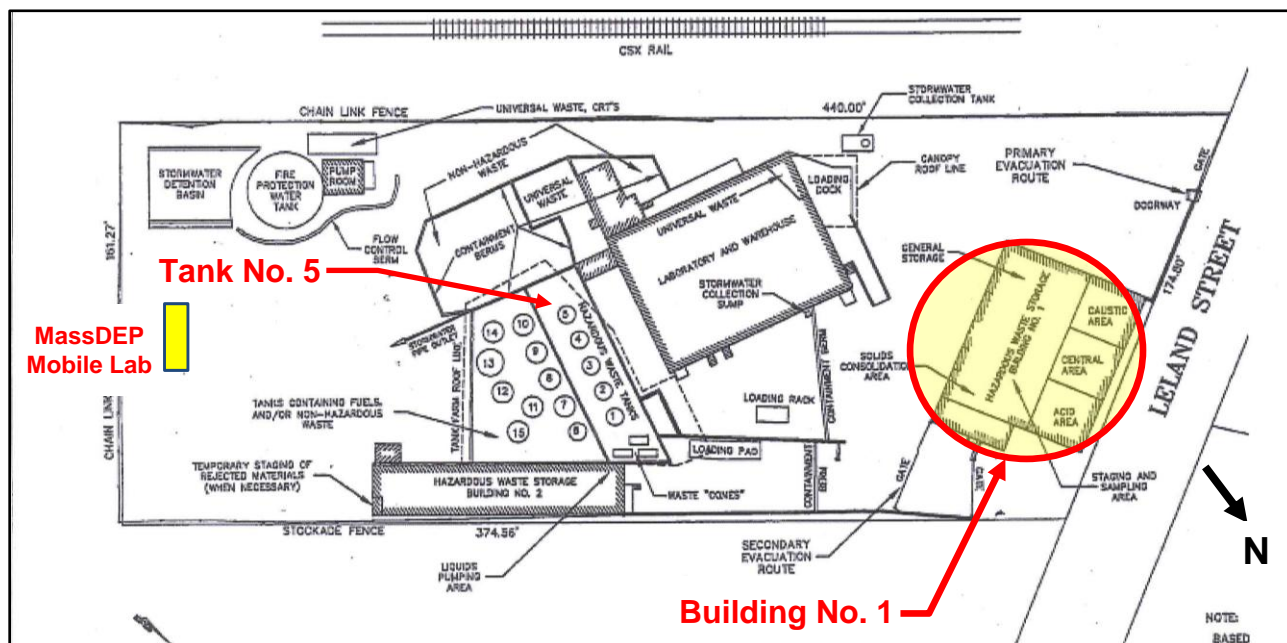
Decontamination Pilot Test Locations – Facility Plan
